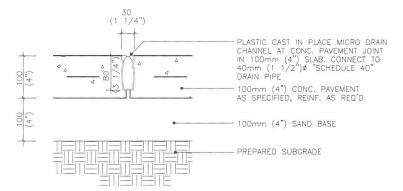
Polymer pavement strip drain. Various sizes for cast slab applications available. Warm climates only.
